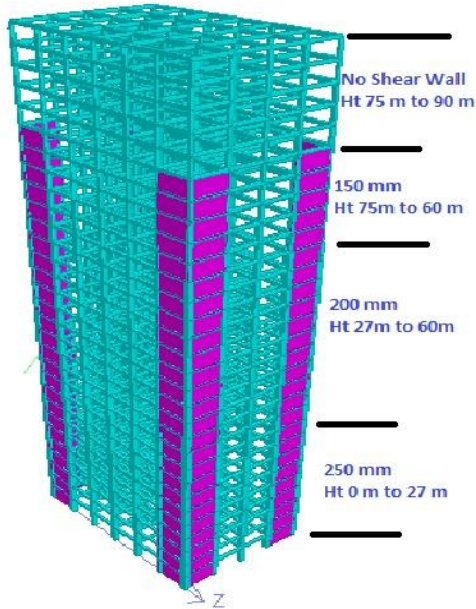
D View of Frame with Position of Stepped Shear wall with curtailment at top stories
